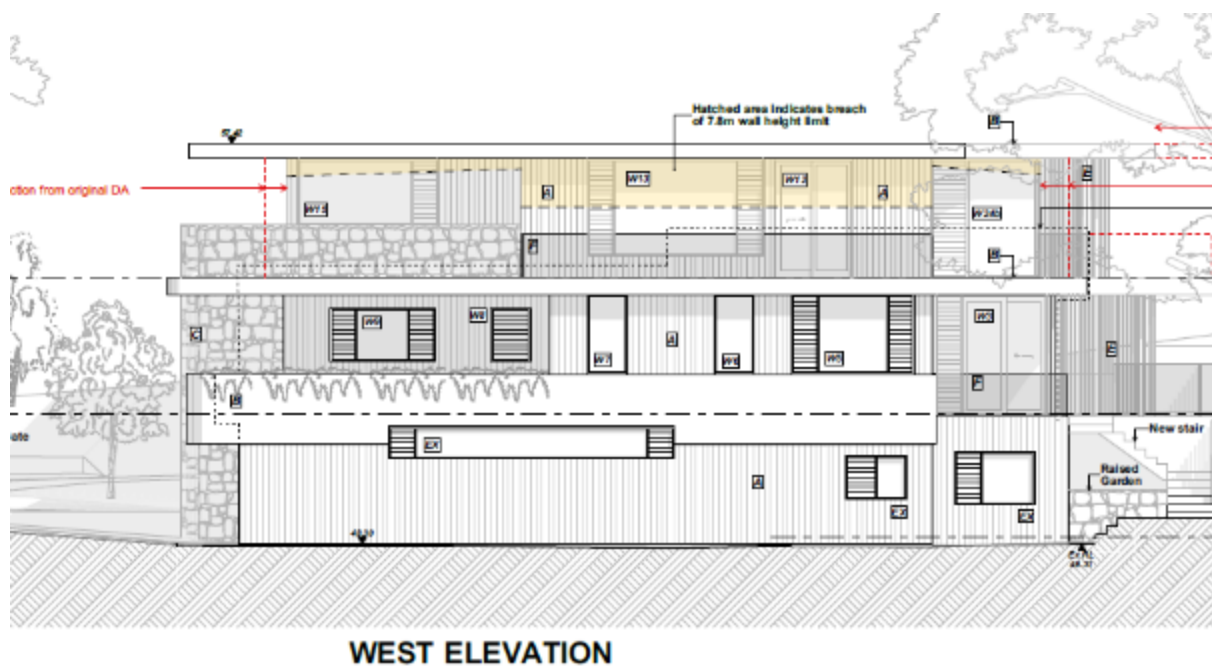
Plan extract depicting the extent of wall height breach along the western façade of the first floor addition
